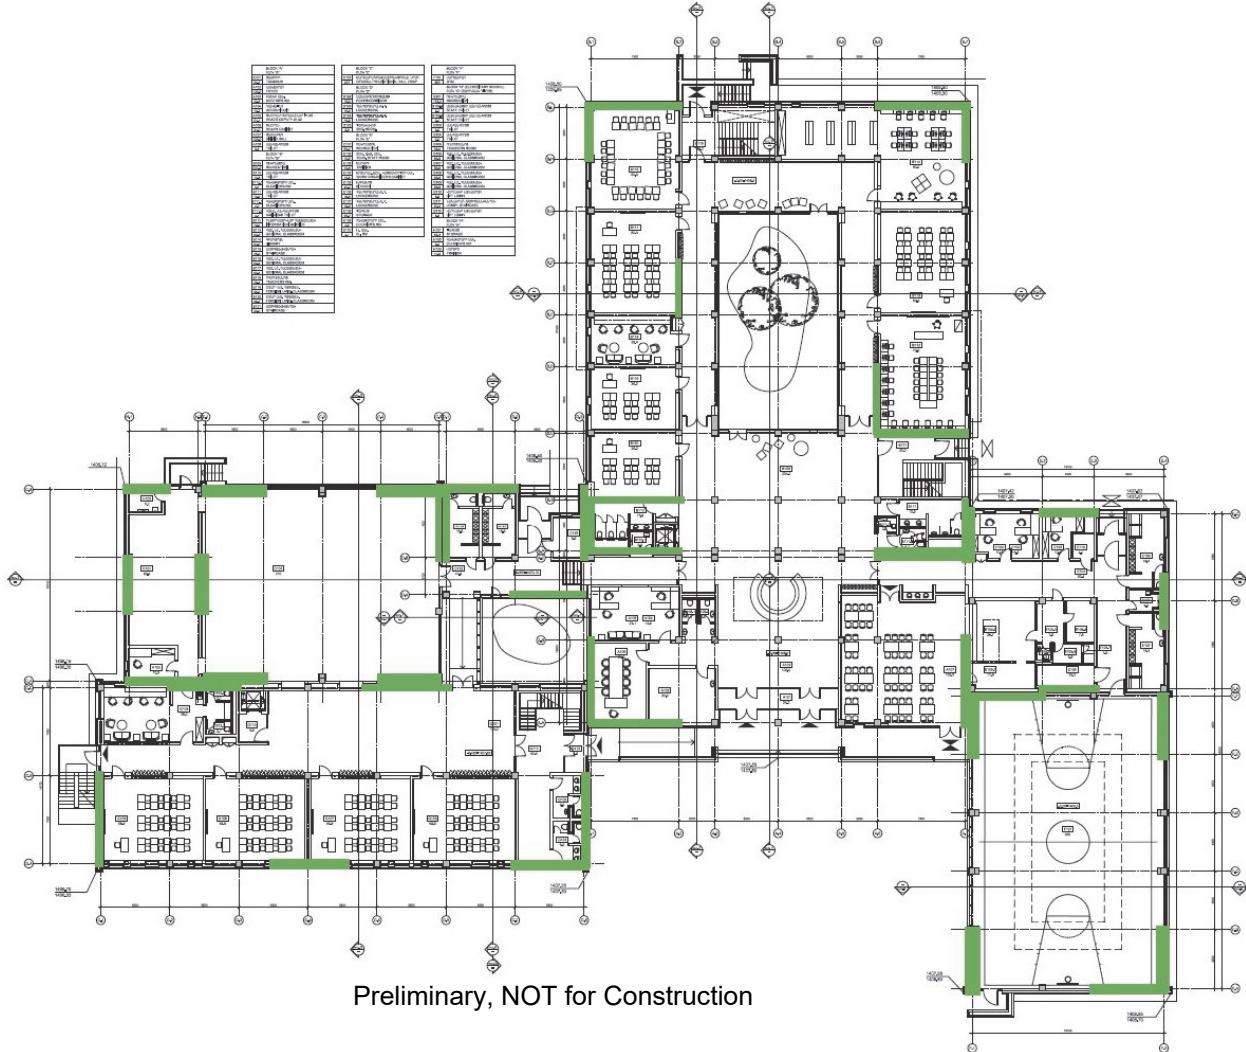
Ground floor plan of UNDP prototypical new school. Heavy lines indicate conceptual locations of concrete shear walls.
